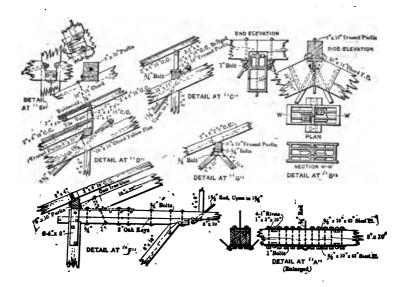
Details of Truss Framing in Forestry Building, Pan-American Exposition.
